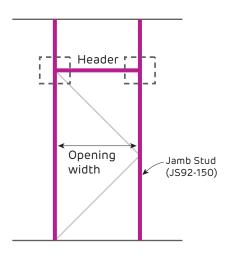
Header to Jamb Stud Connection With Jamb Stud Connector Bracket Elevation
